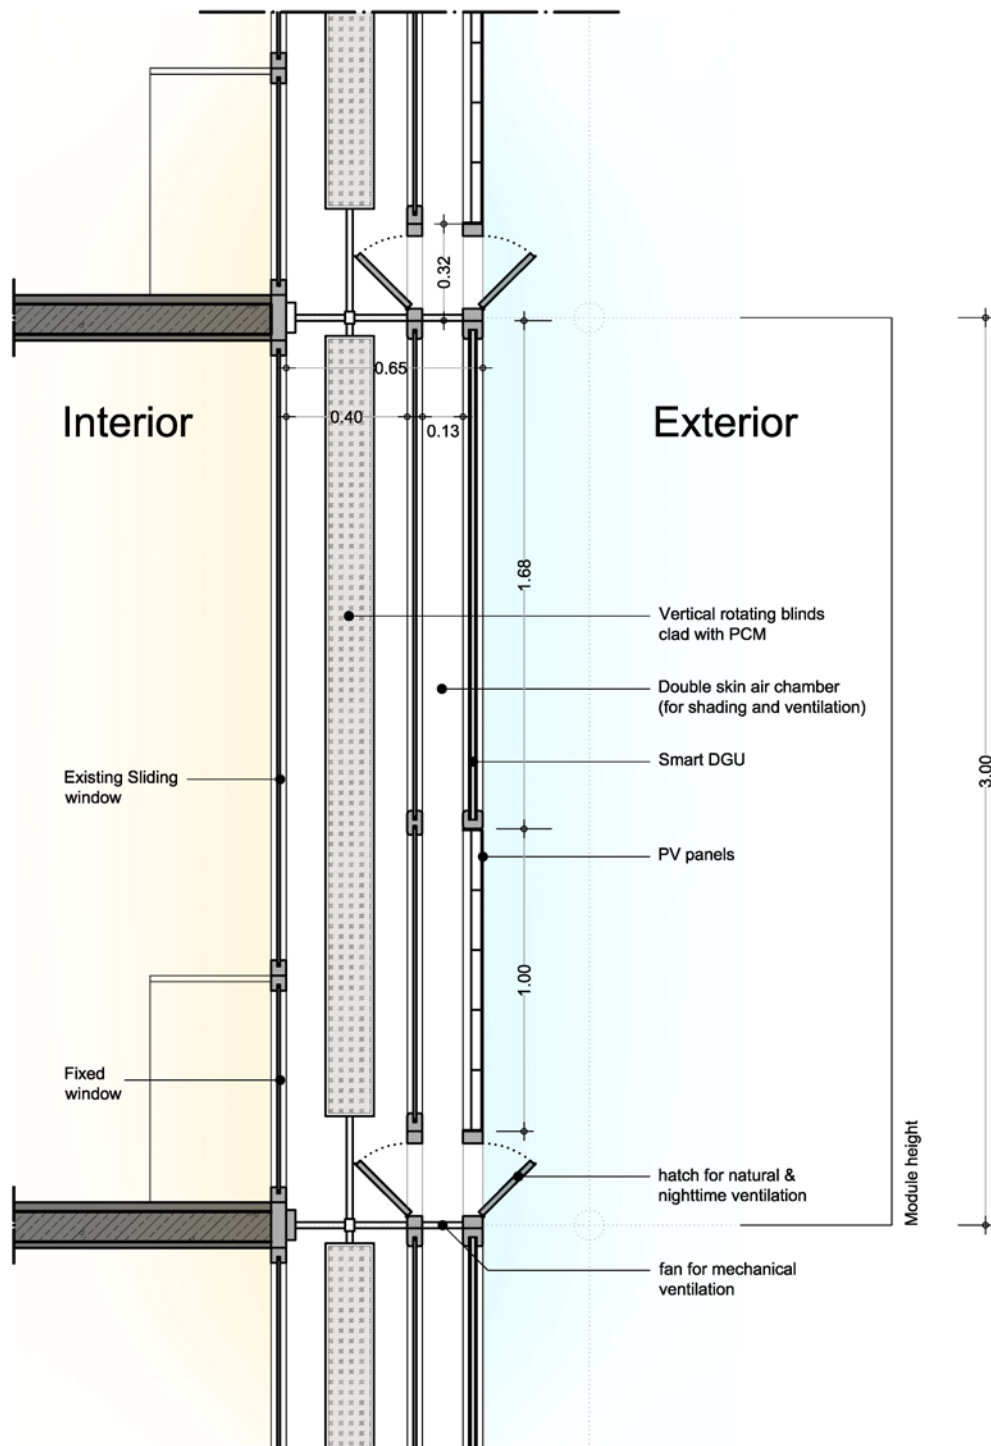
Cross section of the proposed retrofit module installed on a curtain wall facade.
